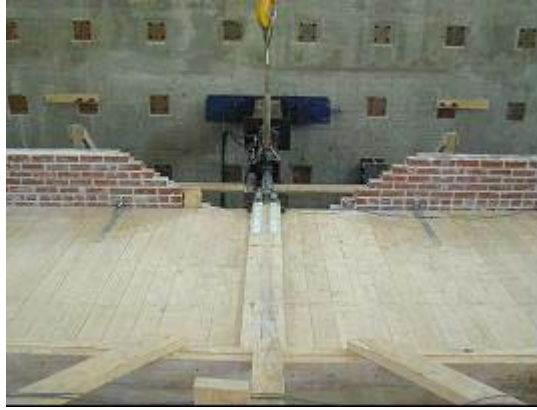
Sliding between the joists and the out-of-plane wall (Run 17 with tension ties and Run 18 without tension ties)
